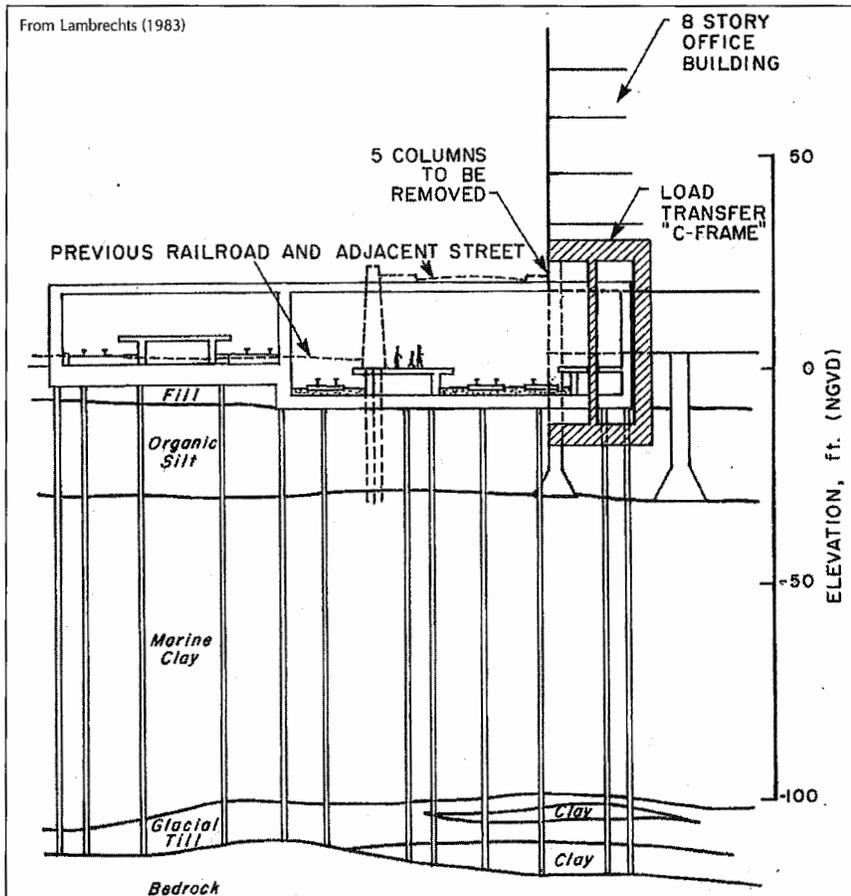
Section through the Back Bay Station showing the underpinning and the load transfer "C"-frame building support.
